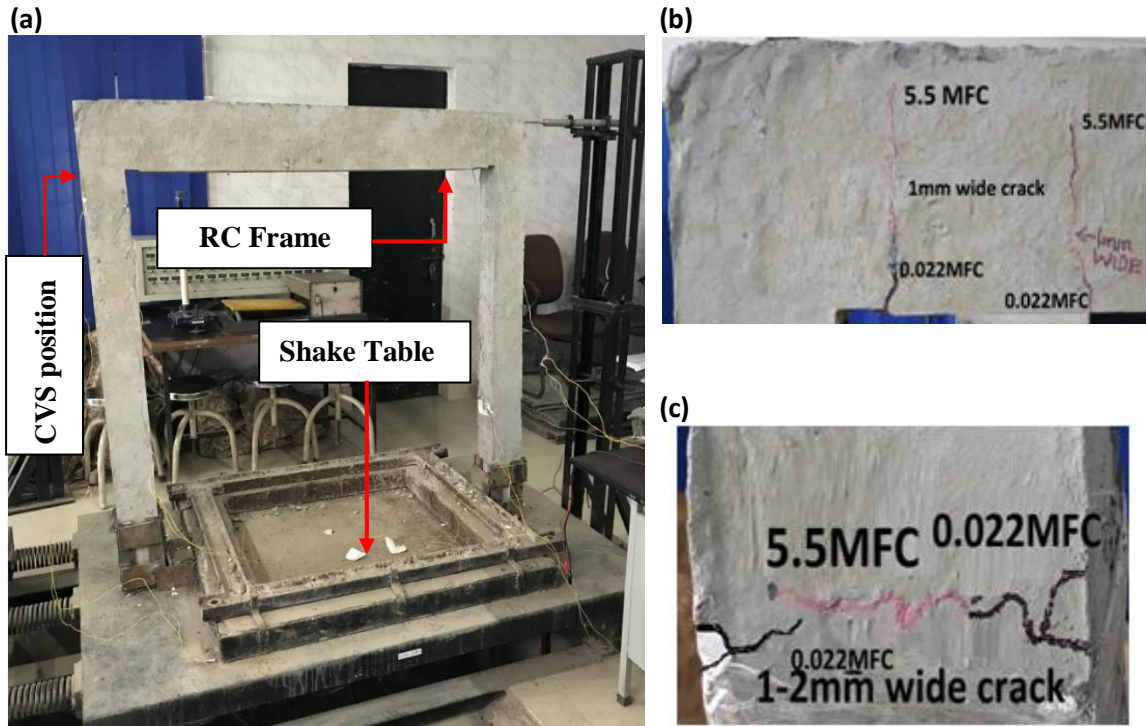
(a) Typical setup of healthy reinforced concrete frame clamped on shake table; (b) Cracks developed in beam of considered RC frame near CVS location after failure; and (c) Cracks developed in column of RC frame near CVS location after failure.
